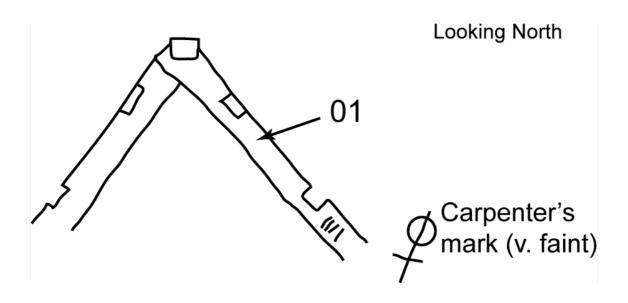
Sketch of truss 1, viewed looking north, showing sample location
